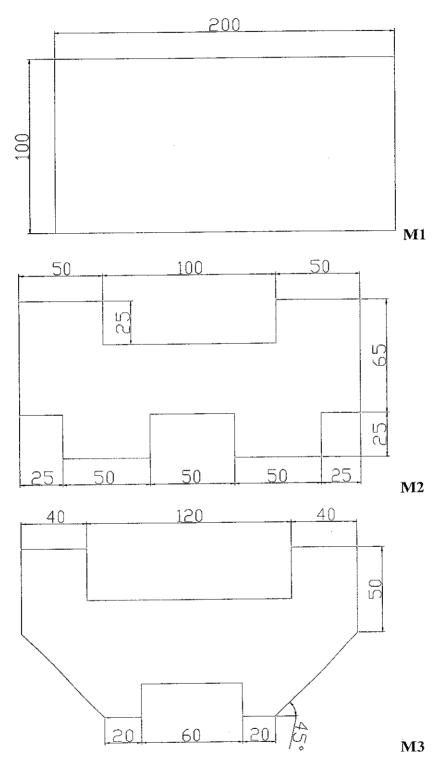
Section view of floating breakwater models (dimensions unit: mm)
